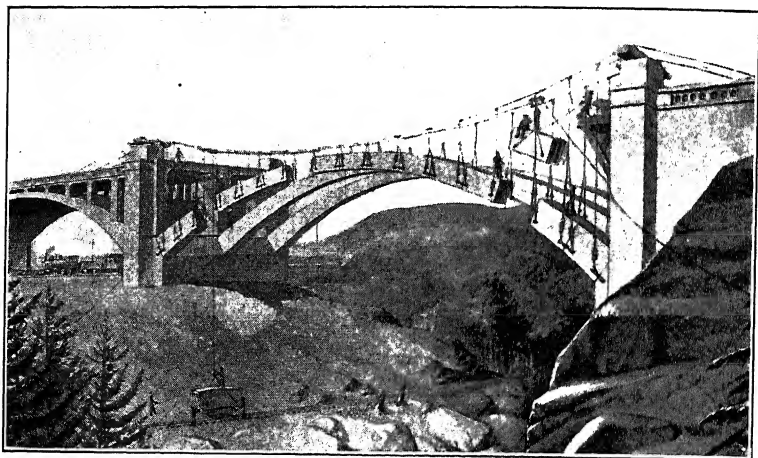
Construction view of Chickahominy River bridge near Richmond, Va. Suspended centering in place.
